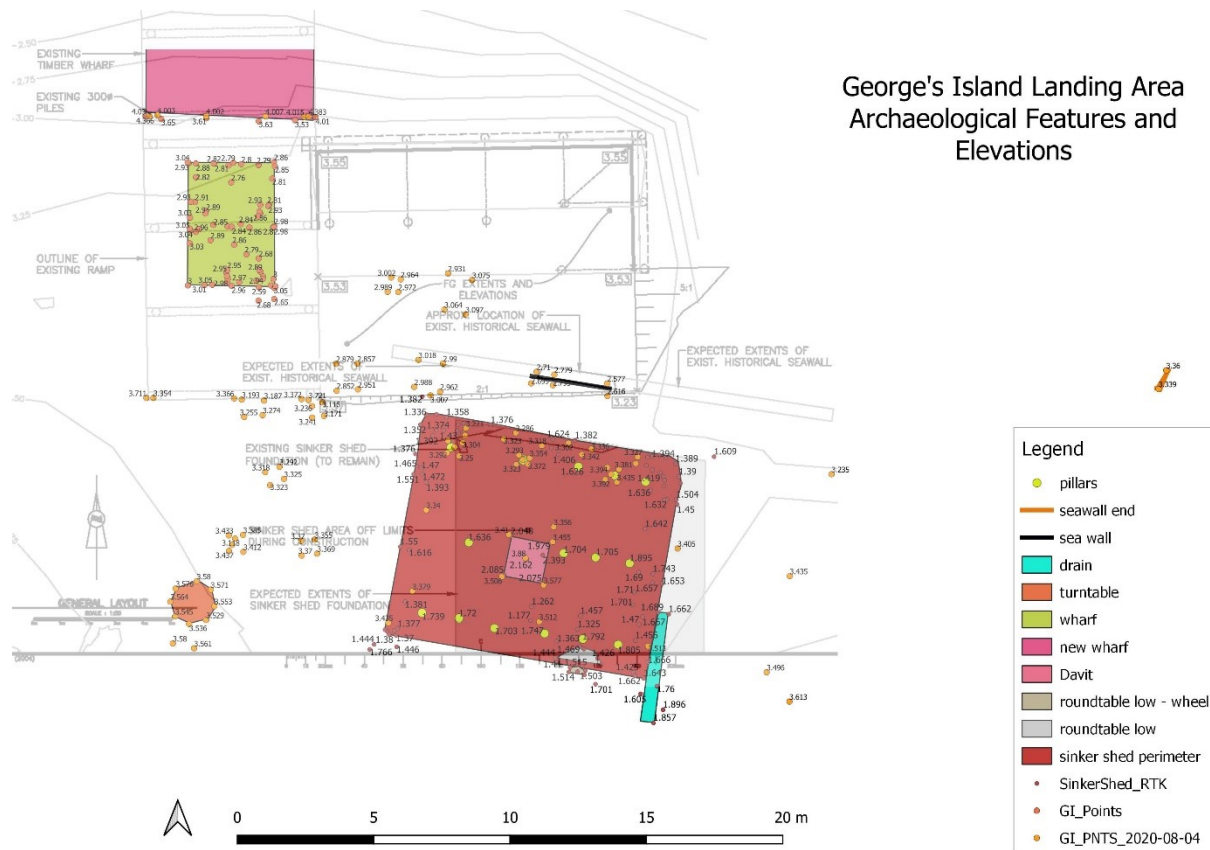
Plan of Sinker Shed with feature surface elevations (masl) in relation to the original wharf discovered in 2019 and the seawall design plan (seawall installed December 2020).
